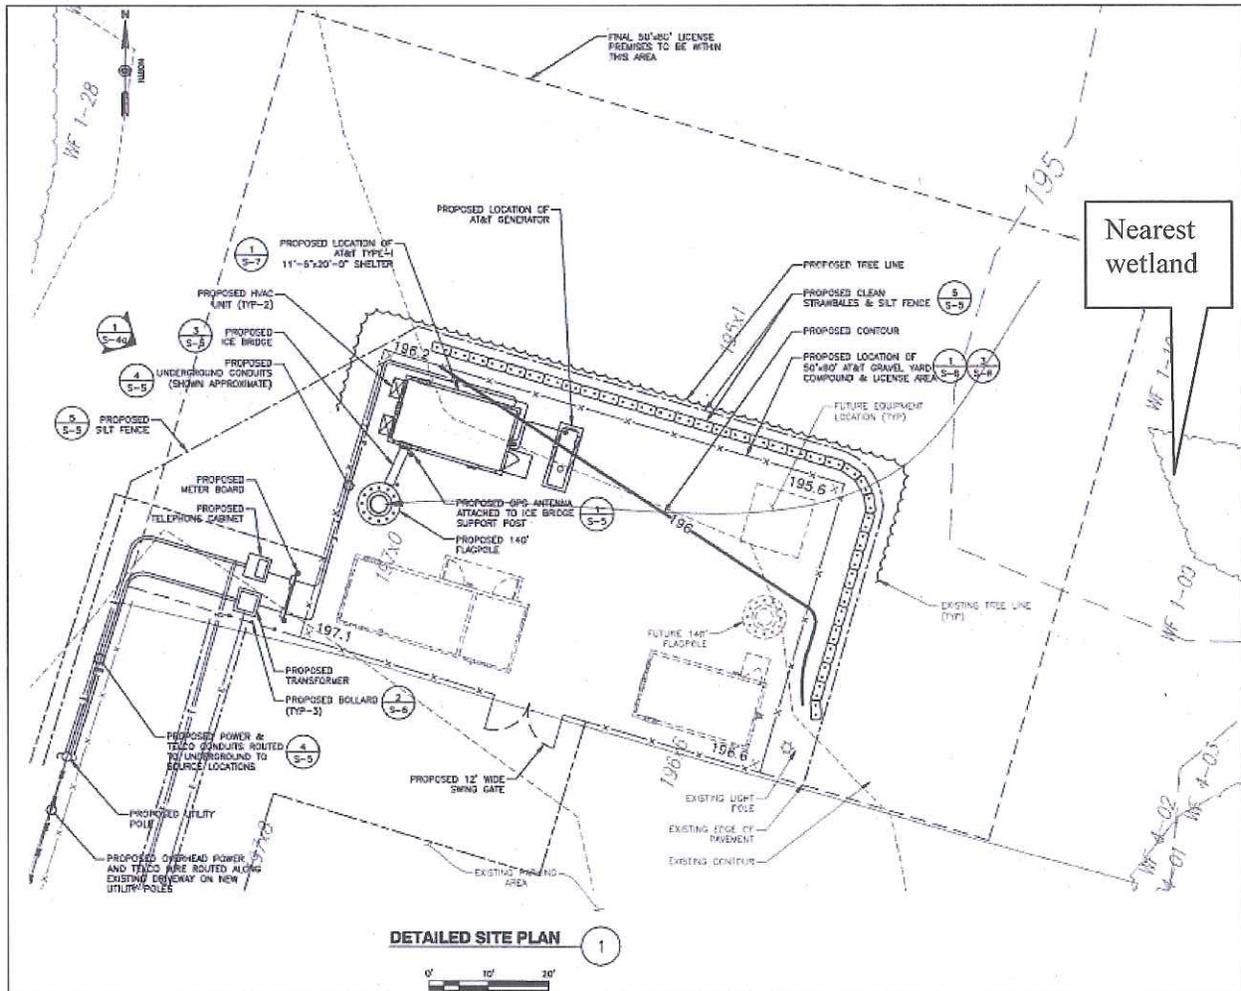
Proposed site plan. (AT&T 1, Tab 3)
